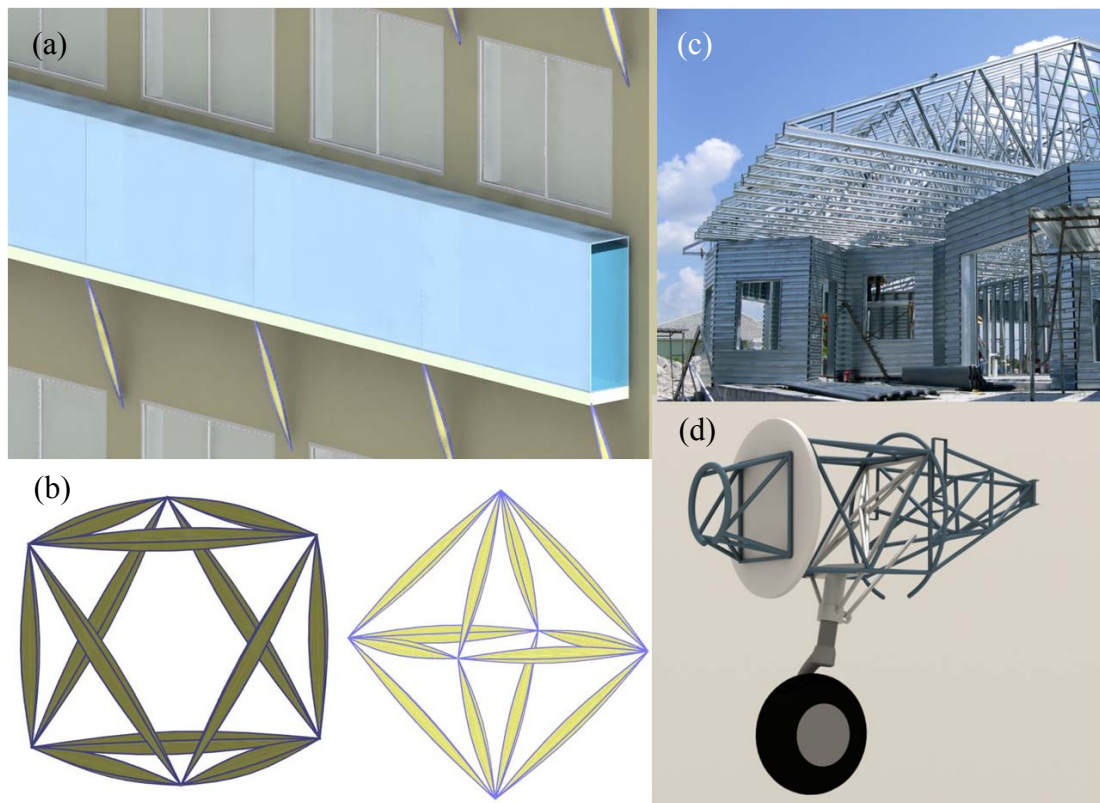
Potential applications of TSS: (a) a column supporting façade system; (b) truss systems; (c) truss in a building; (d) truss in a part of airplane.
